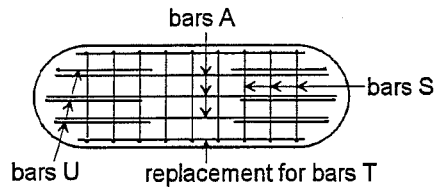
Top Layer Pier Cap Reinforcing in Specimen B
